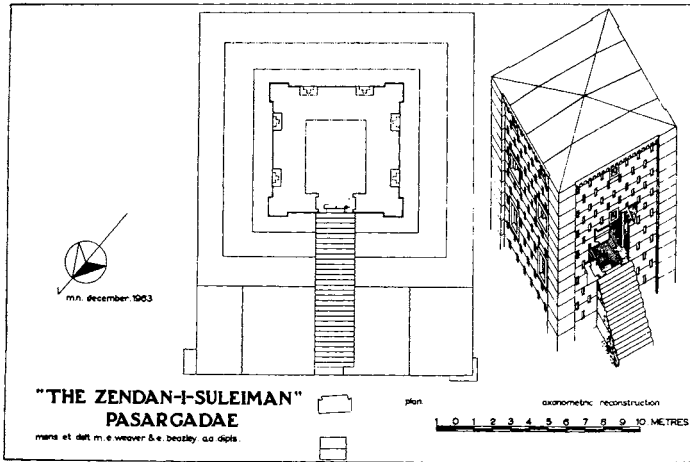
Plan of Zendan with axonometric reconstruction of roof and upper walls at right
